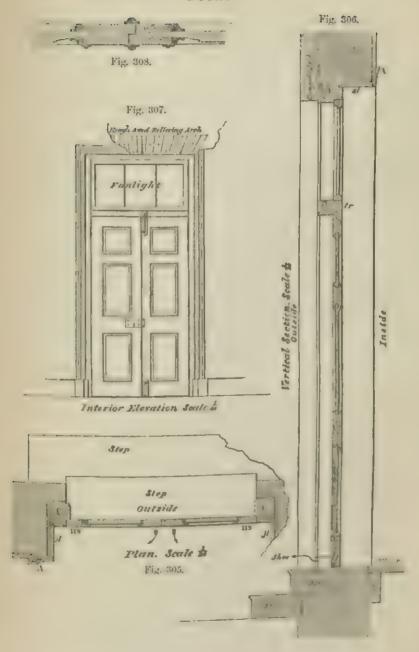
, 306, 307, show respectively the plan, a vertical section through the panels, and the interior elevation, of a sixpunched outer door—hung folding—with a fanlight over it.
